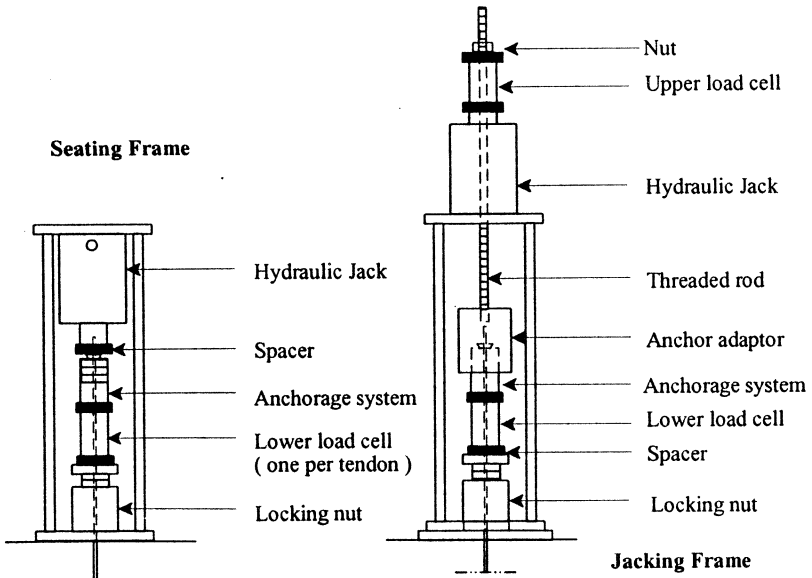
Schematic of seating and the jacking frames used to post-tension the wall.
